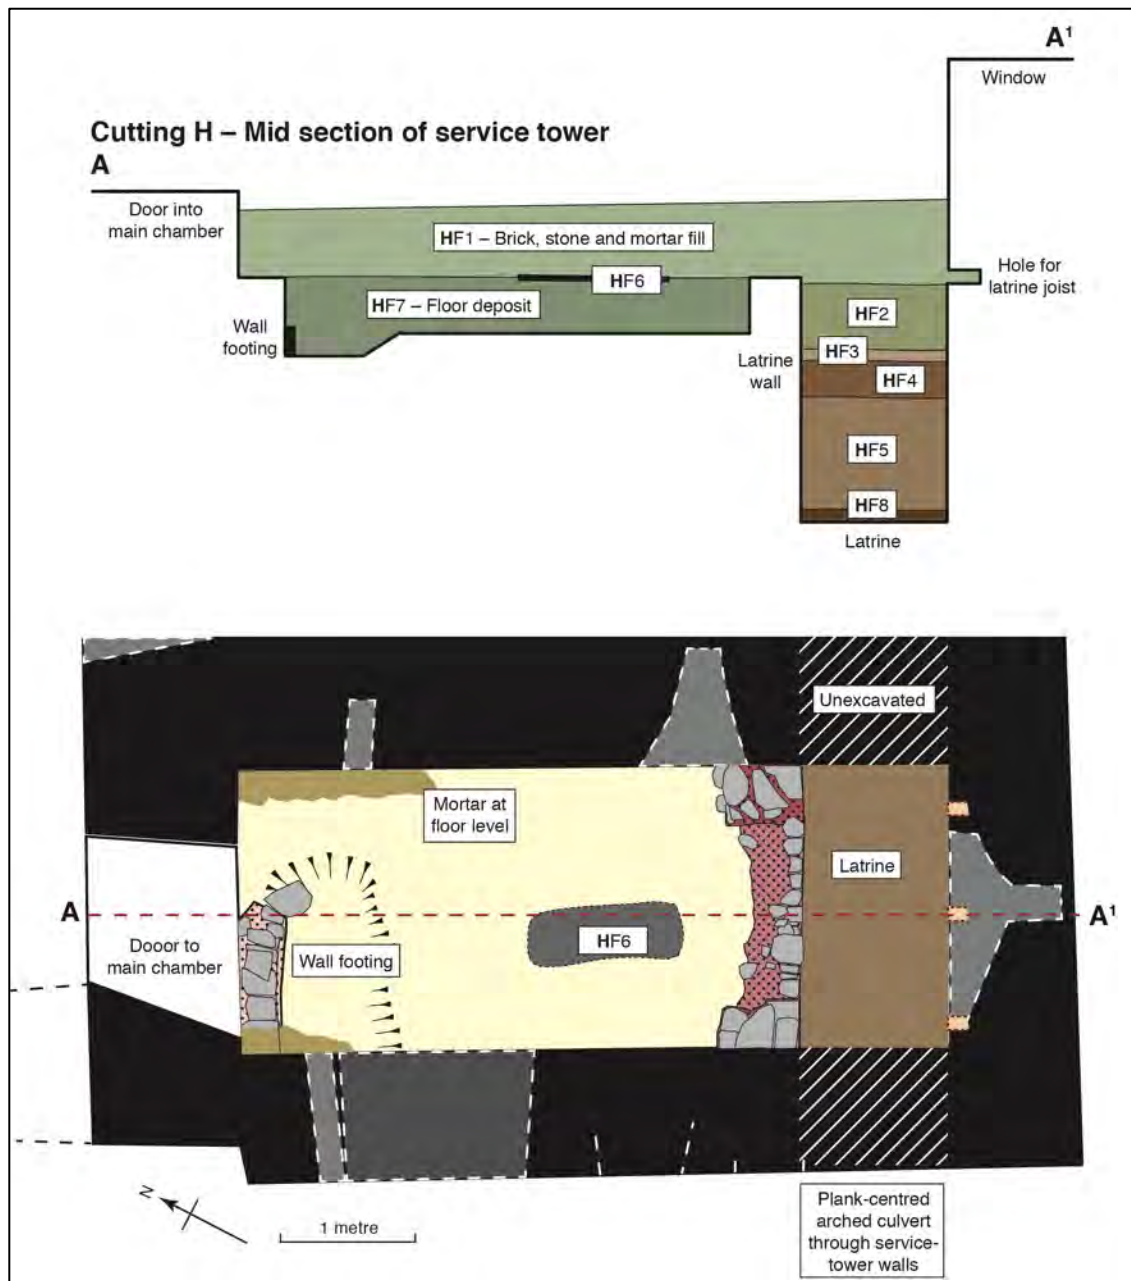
Plan and section of Cutting H, the interior of the service tower.
